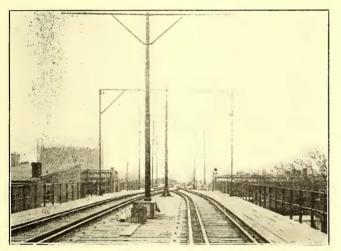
OVERHEAD CONSTRUCTION ON TERMINAL APPROACH
